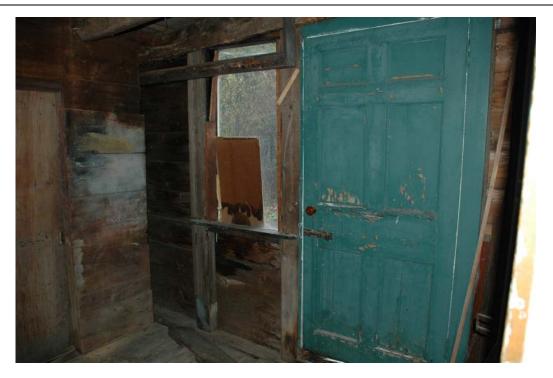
Room 109, south elevation with Door 1/109 and Window 111 (sash missing).
